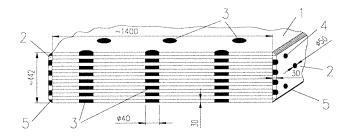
Cross section of a beam: 1 - Beam plates, 2 - Outside plates, 3 - Inner weld points, 4 - Weld points on the side plates, 5 - Weld seams
